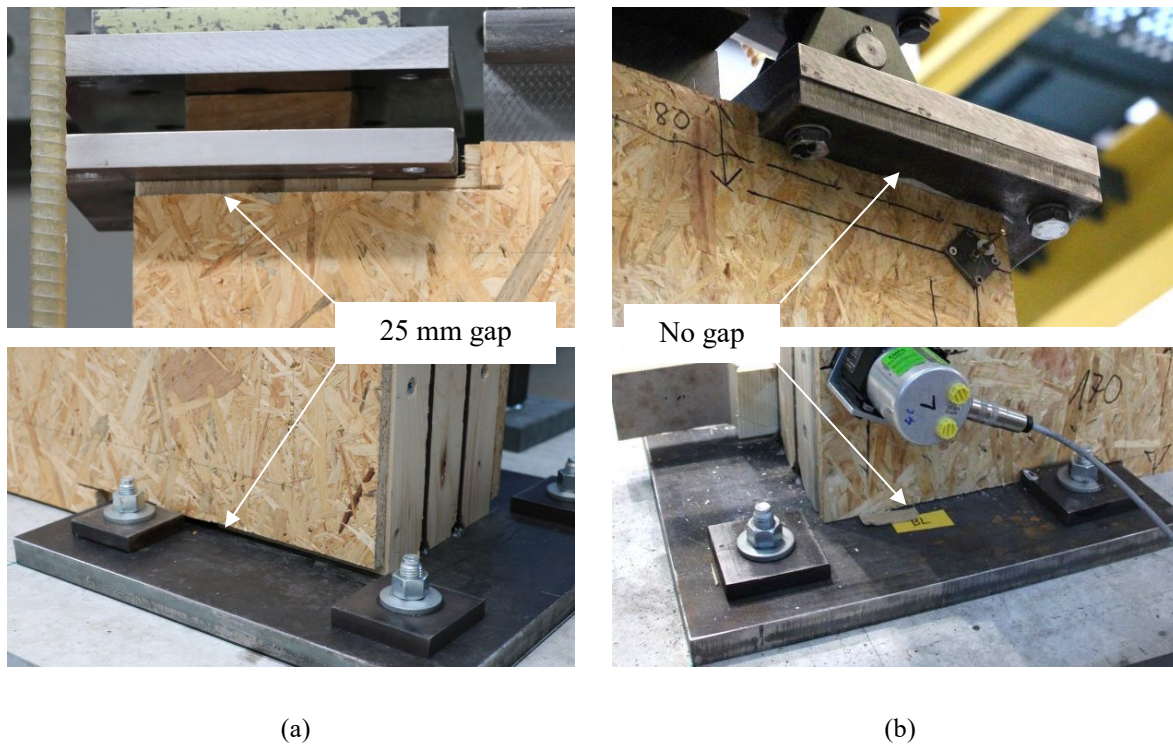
Difference in constructional detailing of sheathing panels leaving a gap between the sheathing panel and the steel anchorage plate: (a) a large gap in test specimen HV-WOB and (b) a small gap in test specimen LV-WOB.
